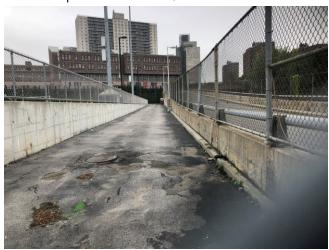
View of damage on the asphalt pavement at the fire lane exit gate.
